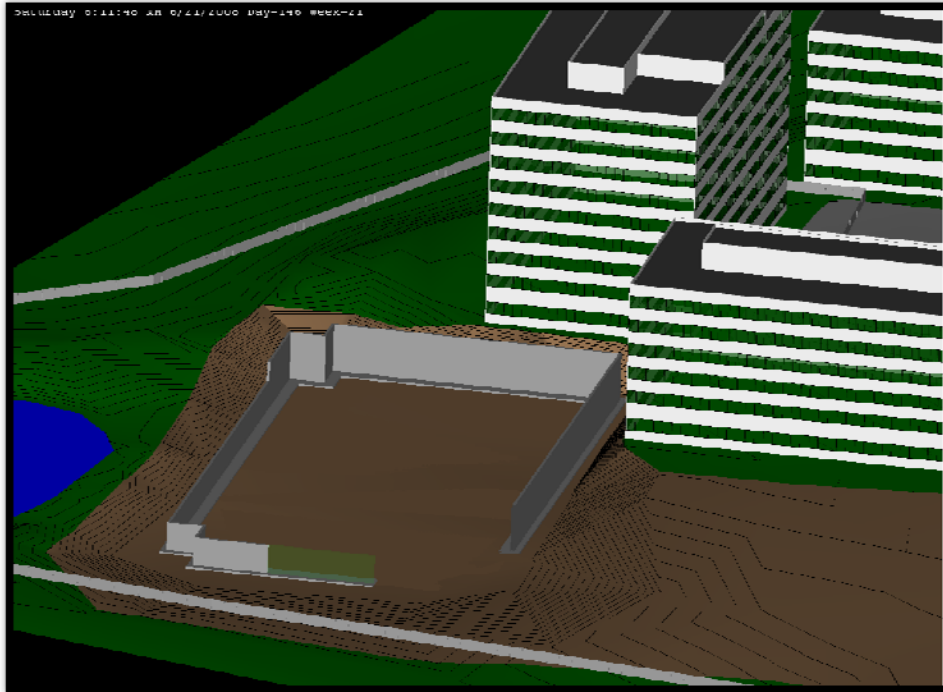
Phase 1 Footing and Foundation Wall Construction
